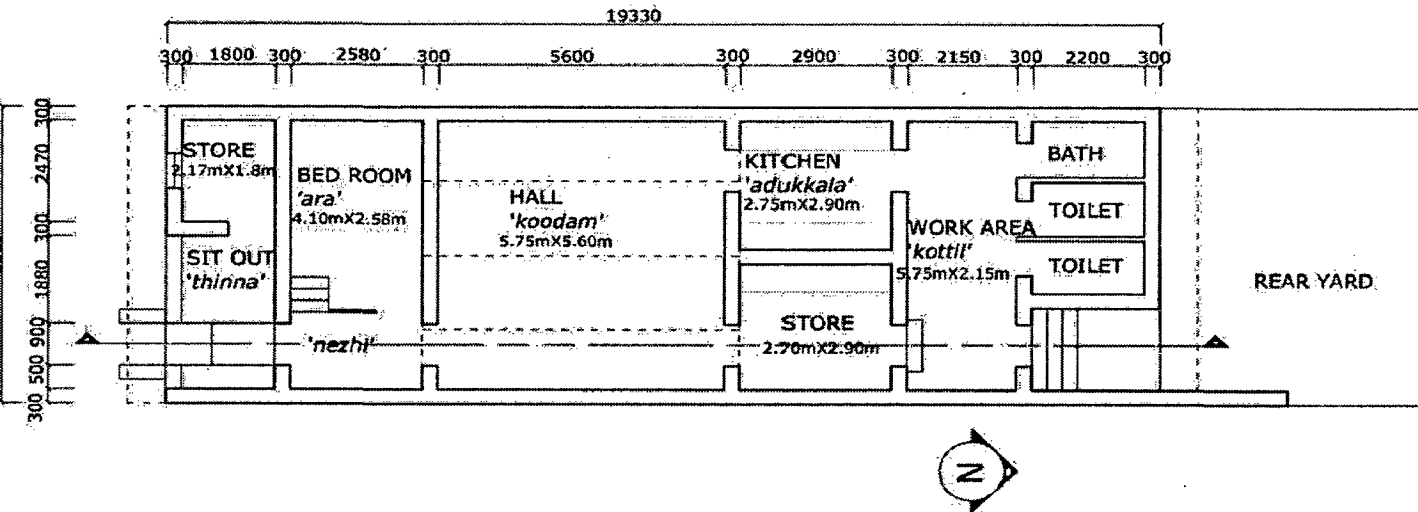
Ground floor plan of residence 2, in New Kalpathy Agraharam
